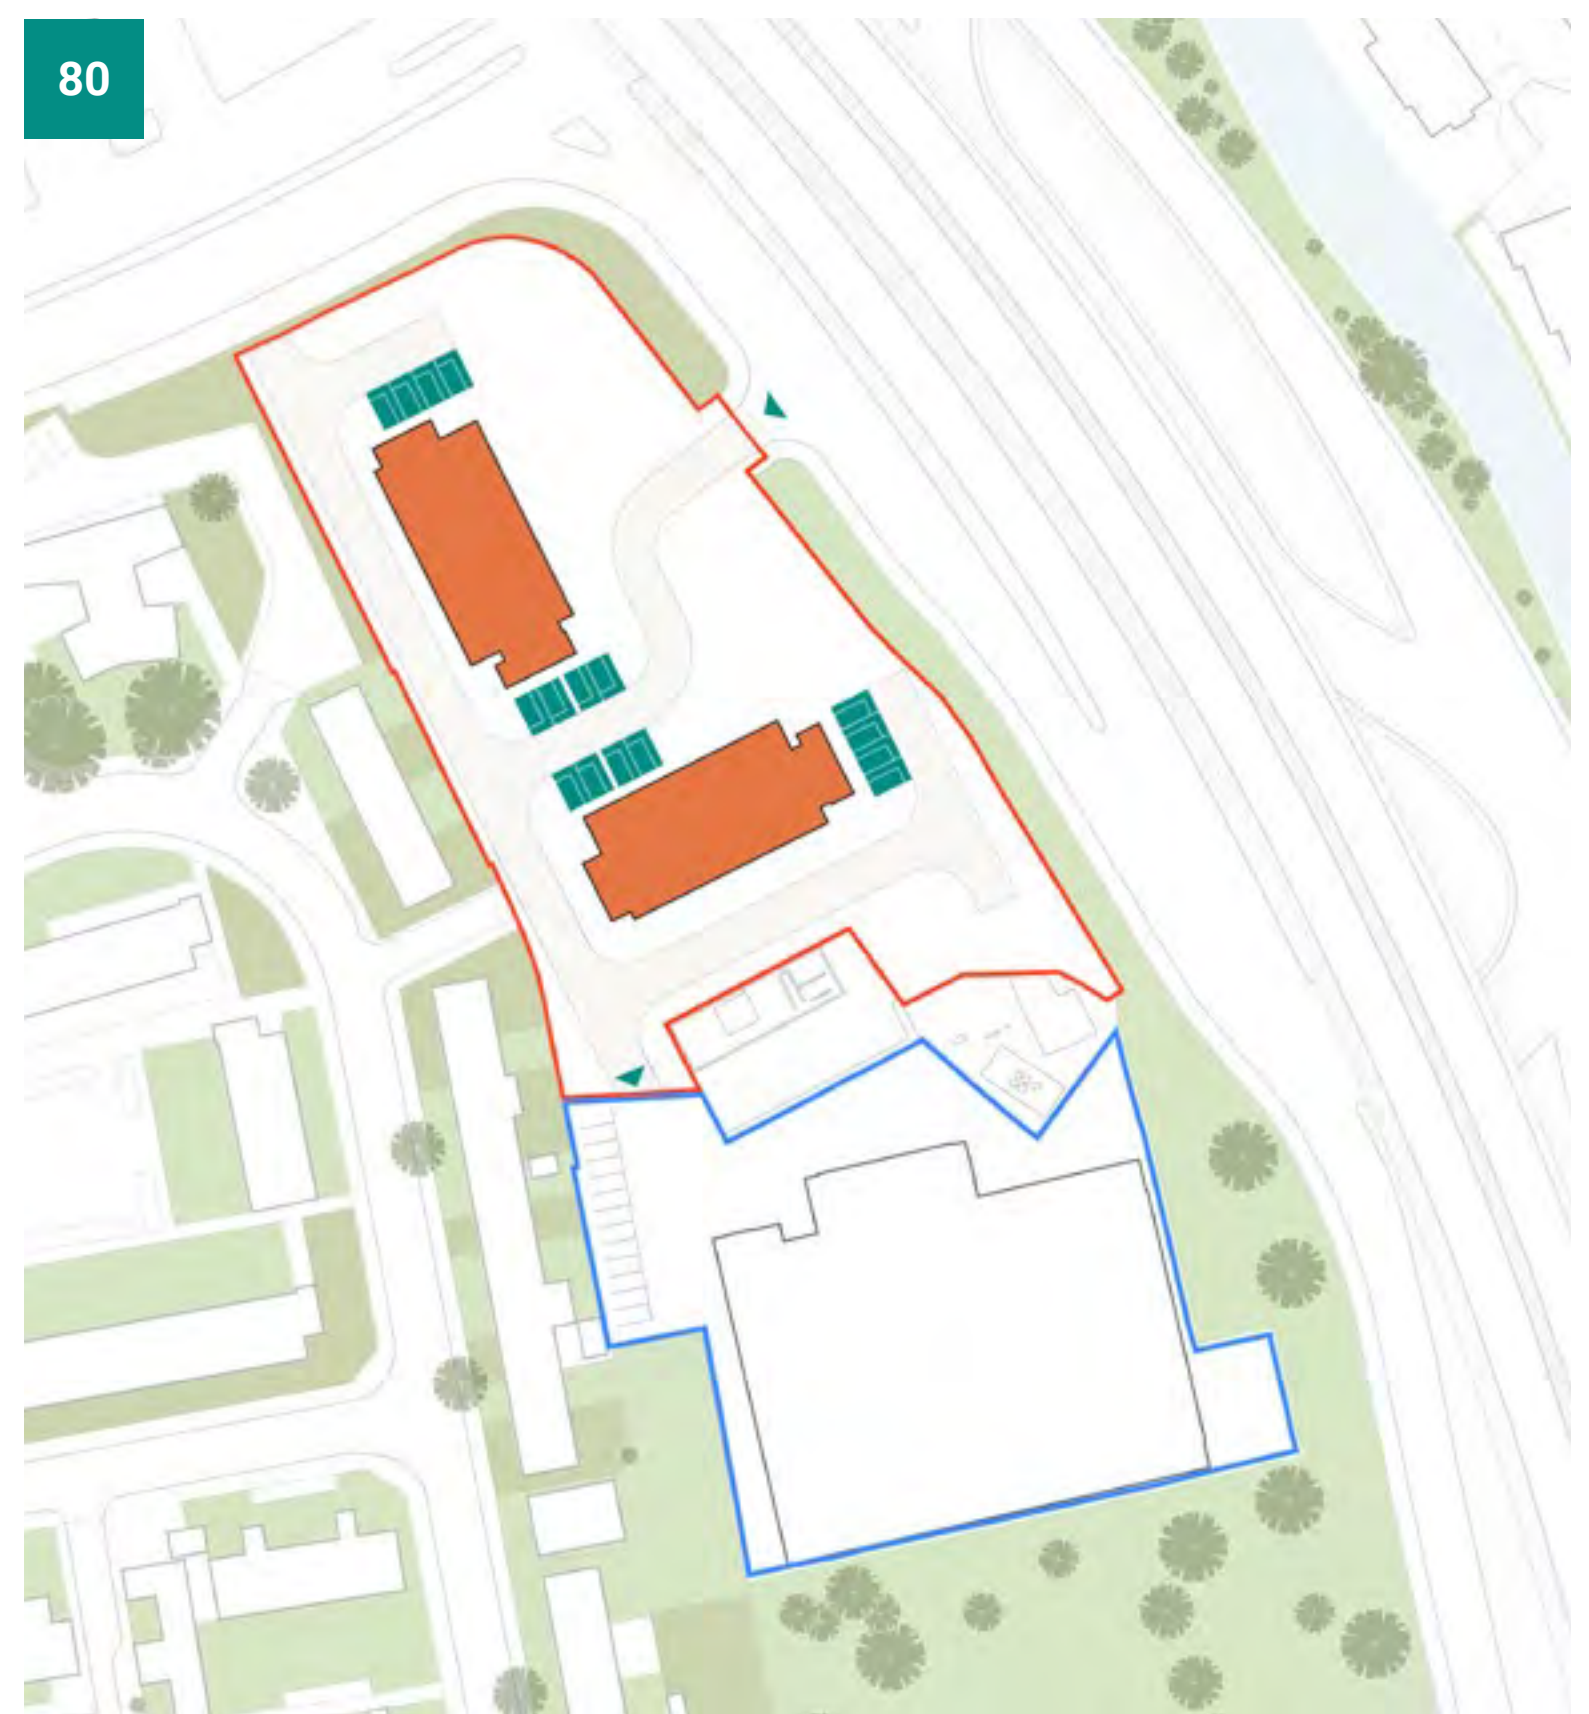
ACCESSIBLE PARKING BAYS DIAGRAM
